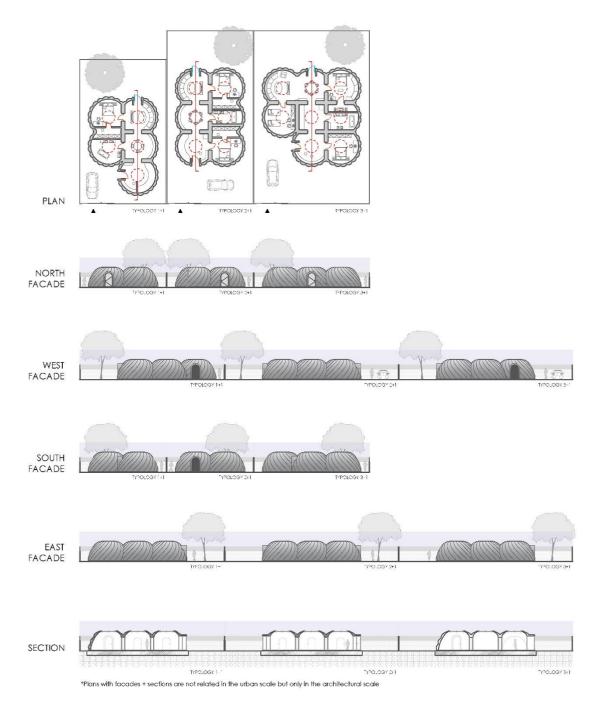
Plans, facades, and sections of Prototype 2 B1, B2 & B3 typologies
